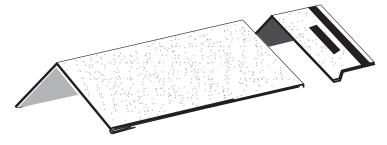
Cutting an EZ-Ridge® Shingle to Make a Hip and Ridge Starter Shingle
